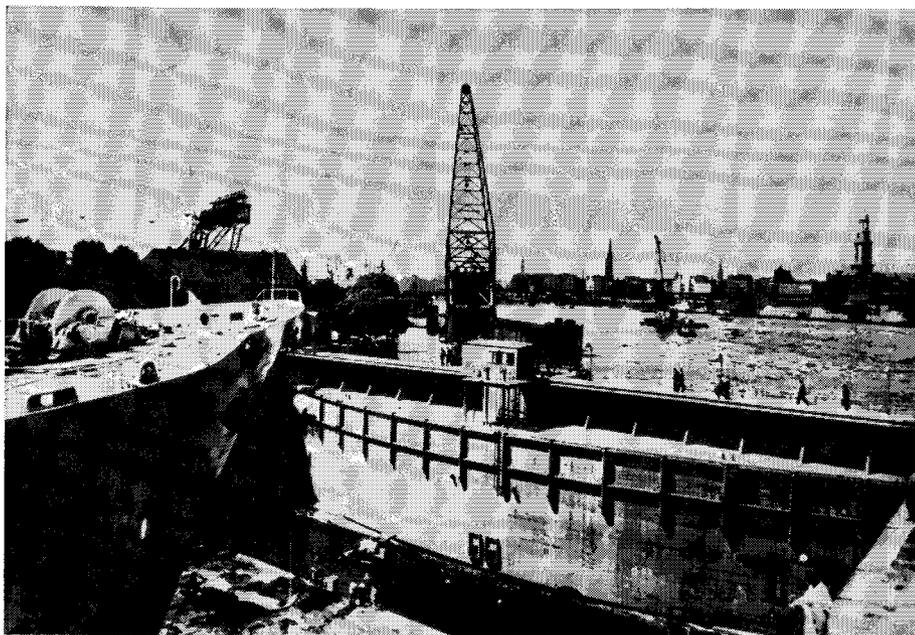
Prestressed concrete dry dock caisson gate at Hamburg, Germany
